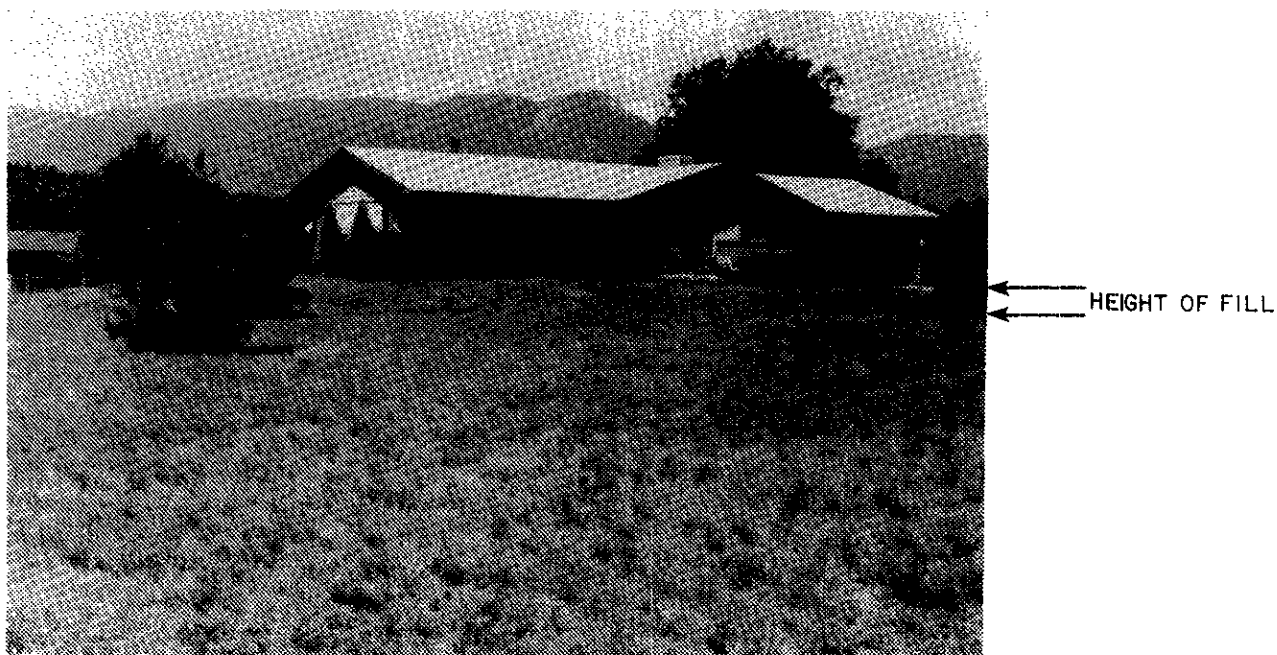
Fill elevation home in Monument Creek floodplain, Colorado Springs, CO.
